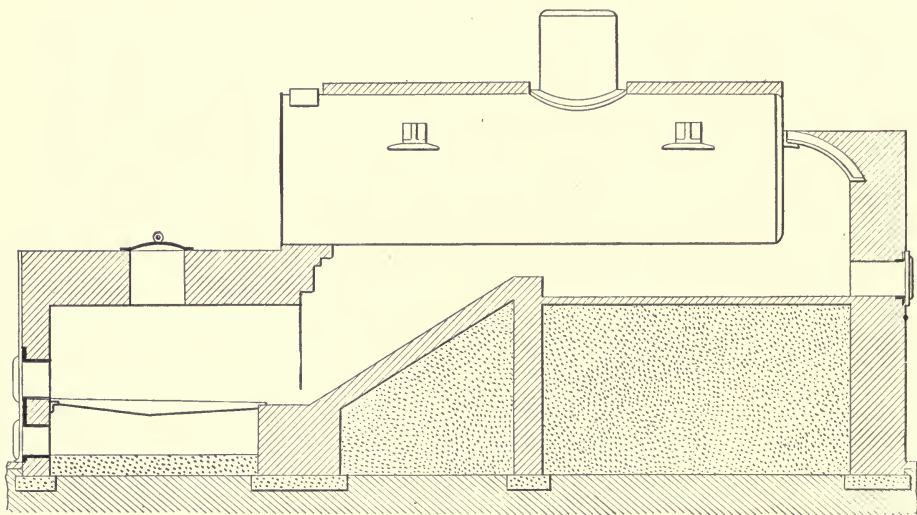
Horizontal return tubular boiler equipped with a Dutch oven furnace.
